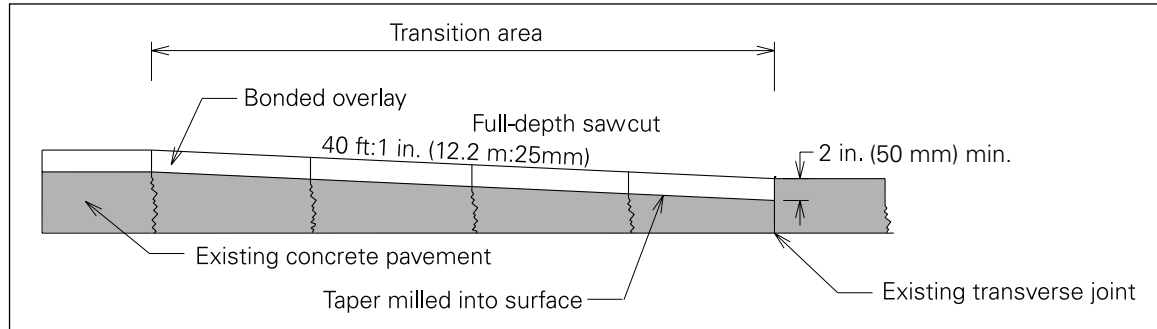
Mill and fill transition for bonded concrete overlay of concrete pavement (adapted from ACPA [1998])
